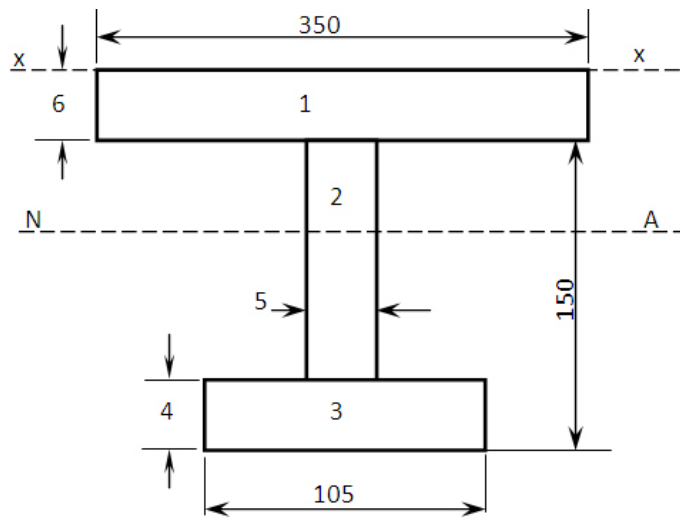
Geometry of one Tee stiffener and attached plate. Four such units constitute RUC of plate stiffened with Tee stiffener
